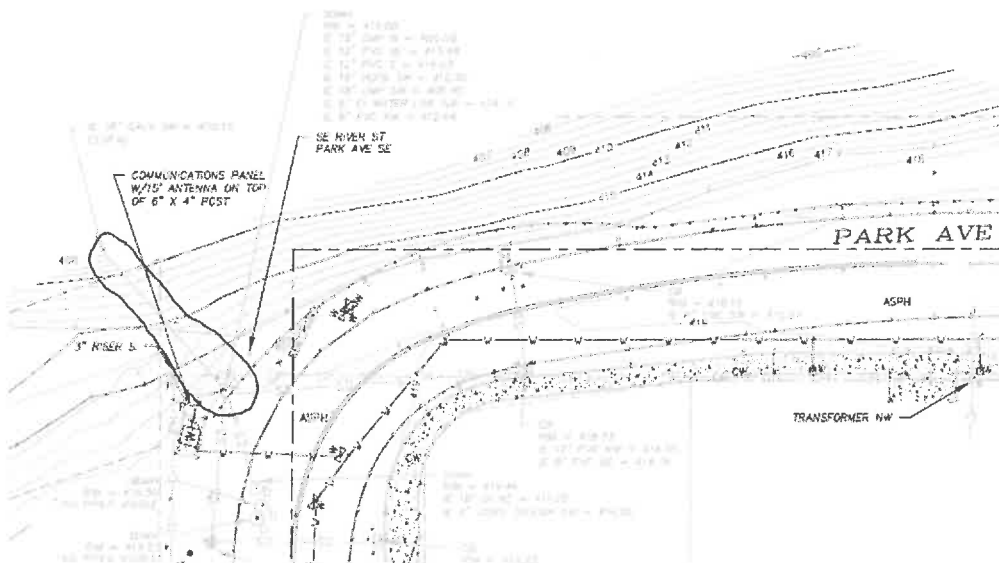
River Street Stormwater Outfall Pipe (circled red) in 2017 KPFF Survey Drawing
